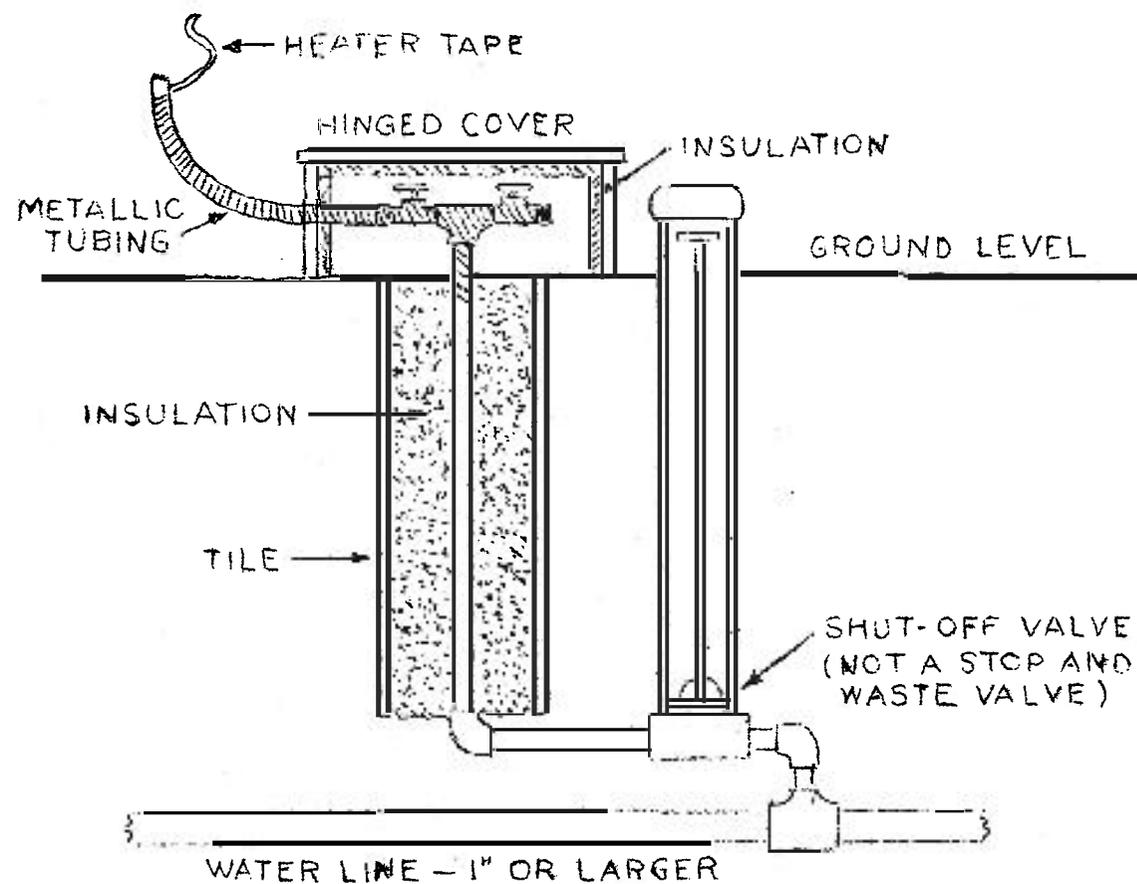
DETAIL OF WATER CONNECTION SHOWING
